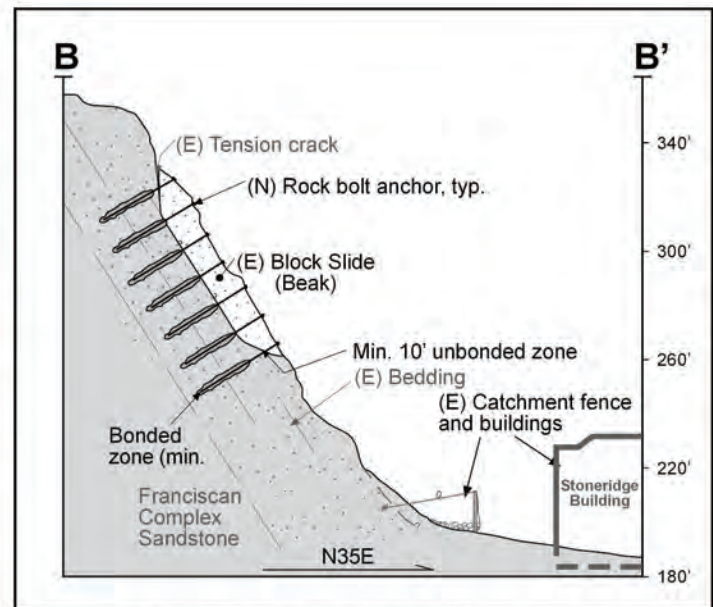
Geologic Cross Section through Stoneridge quarry wall.
